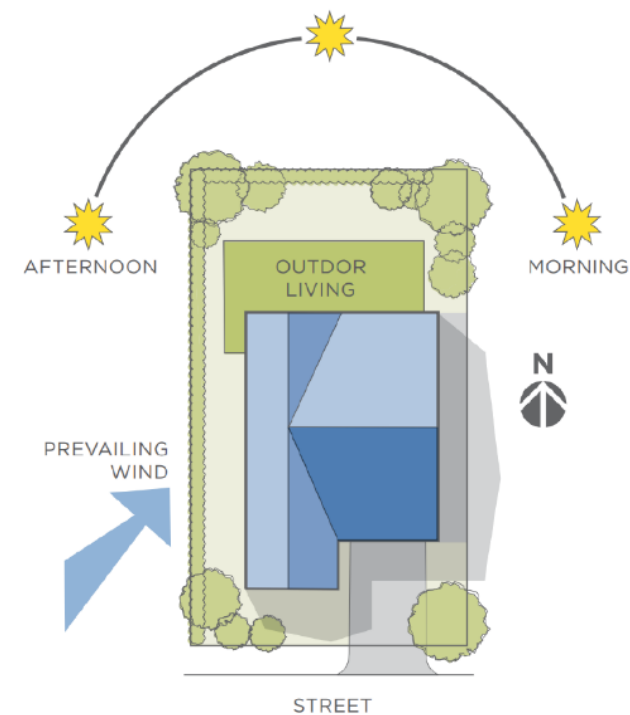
Site analysis showing typical lot layout, solar access, and orientation of outdoor living space.
